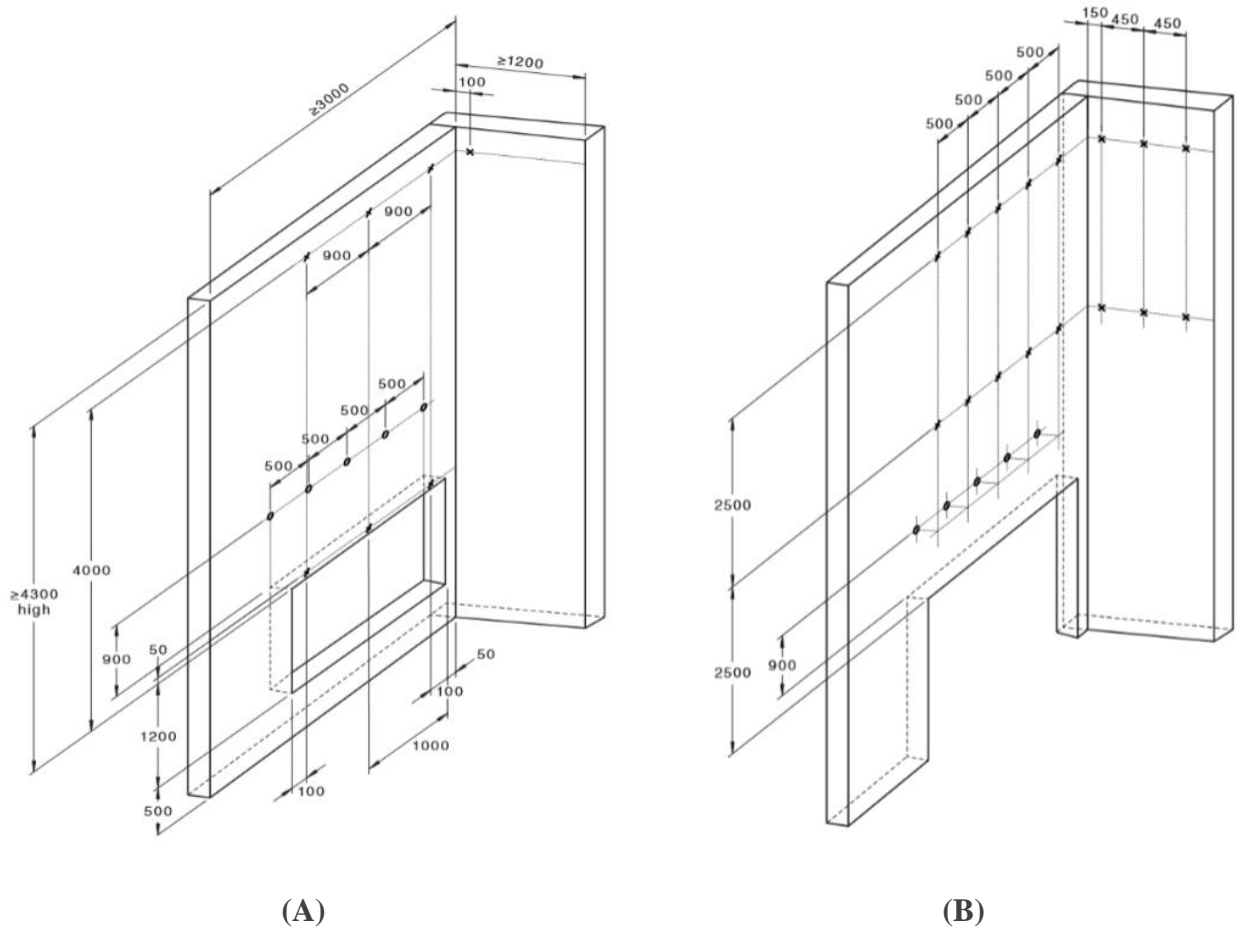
A) ISO 13785 test wall with thermocouple locations; B) BS 8414 test wall with thermocouple locations
